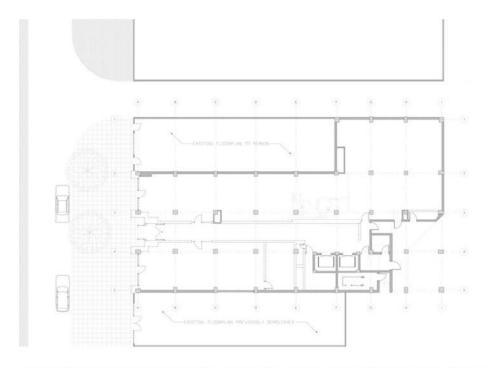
Ground Floor Demolition Plan of 1524, 1522, 1520 K St. N.W. D.C. Source: Eric Gellman
